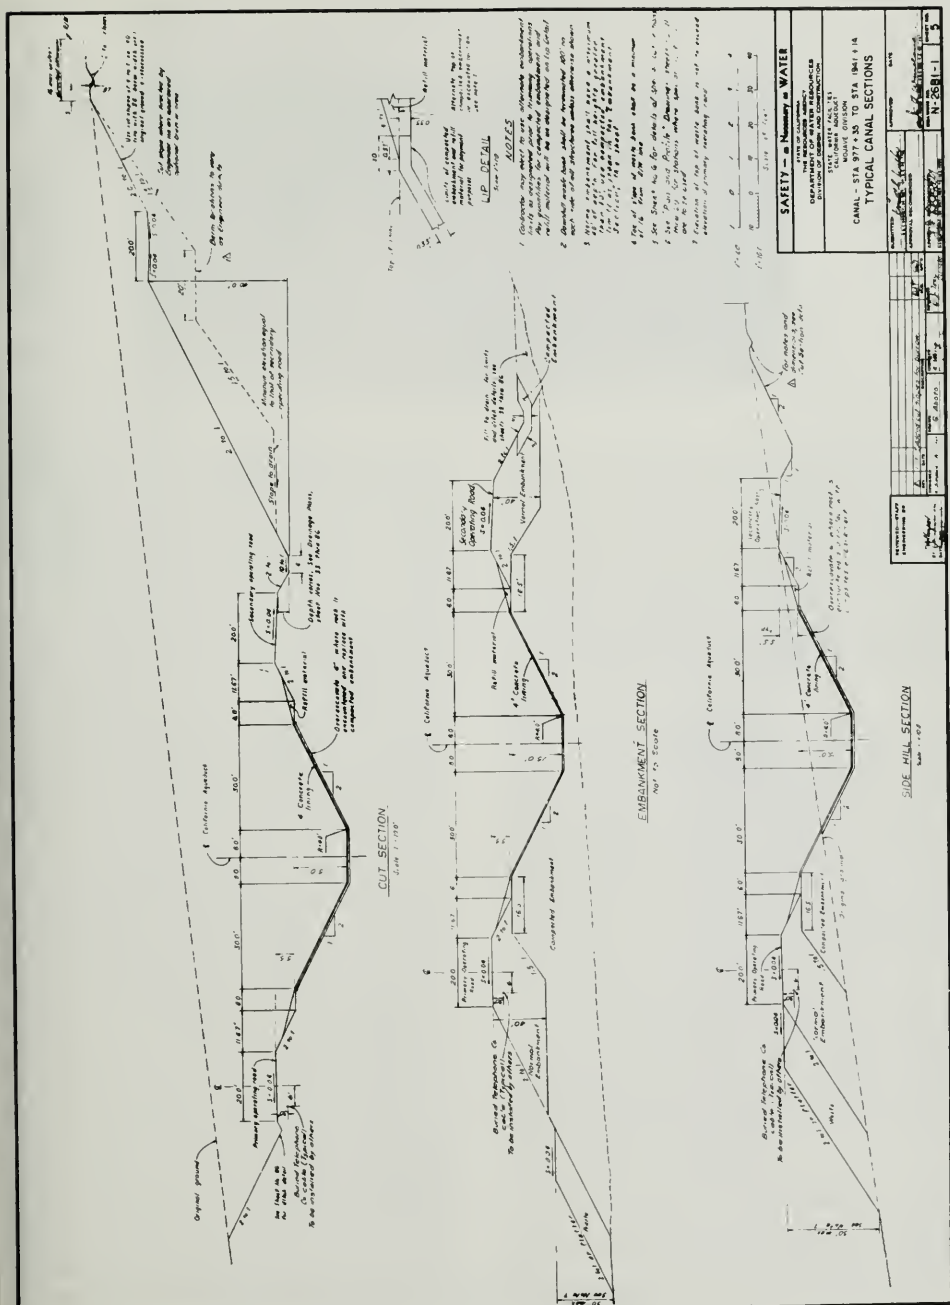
Typical Canal Sections—Fairmont to Leona Siphon
